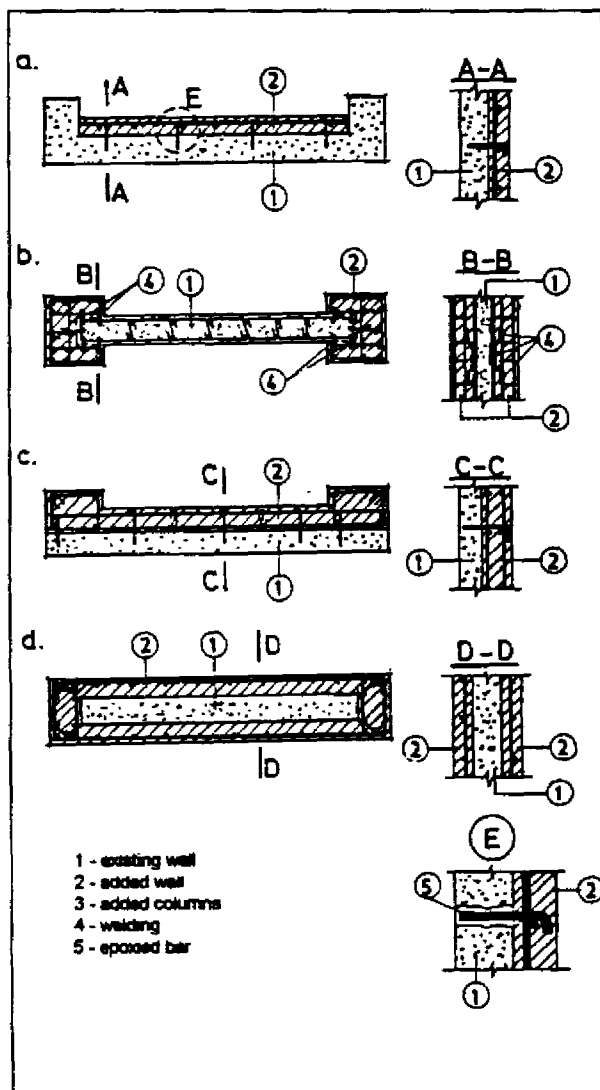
Adding Strength to existing Concrete Shear Wall
